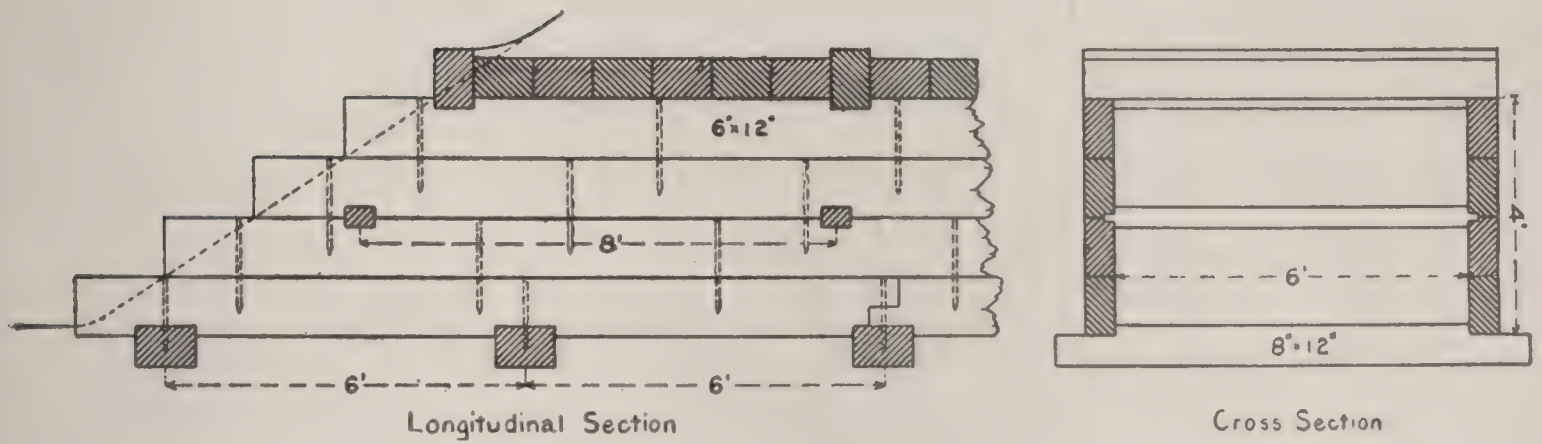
4 ft. x 6 ft. WOODEN CULVERT.
